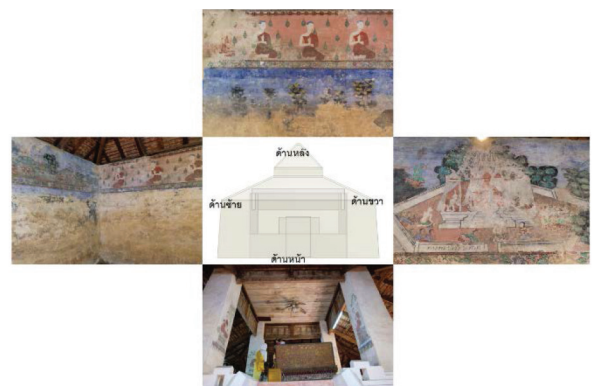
The Damaged mural painting inside the Pavilion, Wat Klang, Nakhon Luang
